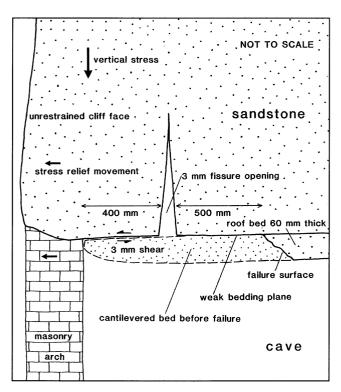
Diagrammatic cross section of the failure of the sandstone bed which forms the roof in the cave behind the Brewhouse Yard Museum.
